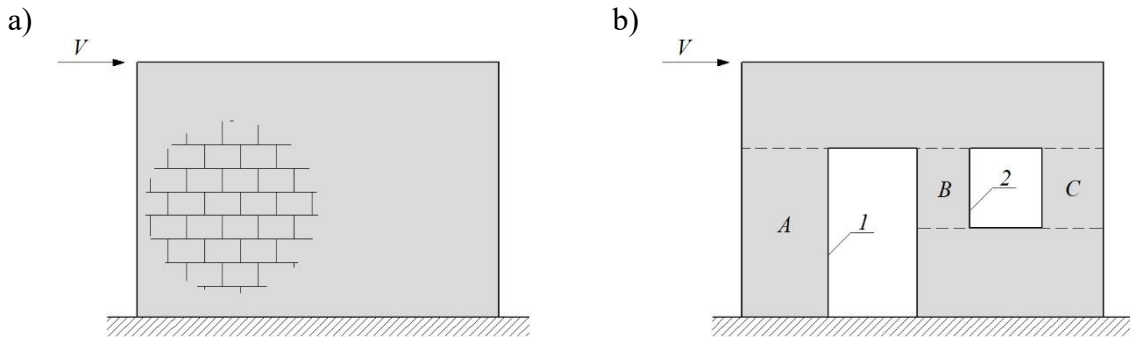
Types of shear walls distinguished in [N4]: a) solid wall, b) perforated wall: 1 – door opening, 2 – windows opening,  $A, B, C$  – piers,  $V$  – horizontal force
